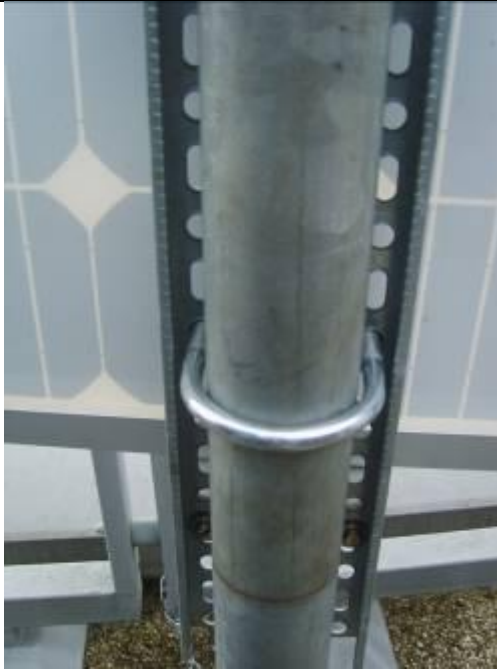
SOLAR PANEL MOUNTING HOLES AND U-BOLTS
